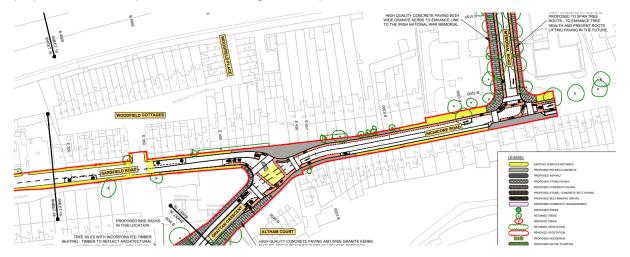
Proposed plans at Sarsfield Road, Inchicore Road and Grattan Crescent.
